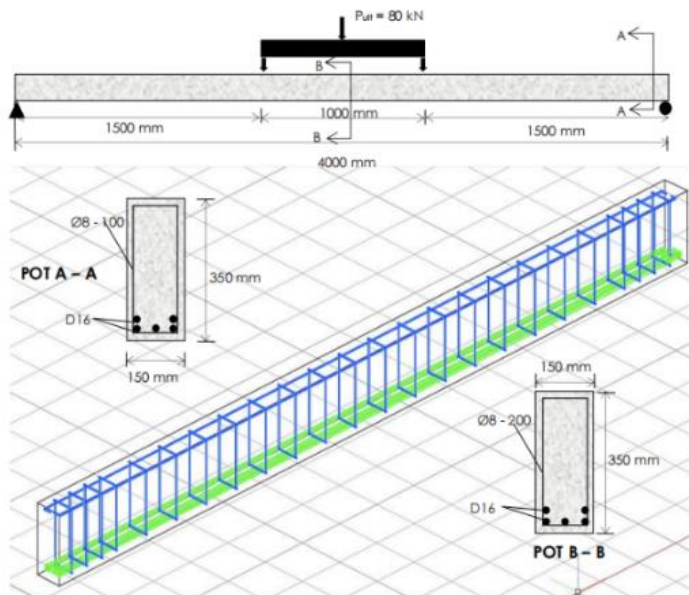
Longitudinal reinforcement of GRC beam and CRC beam [56]
